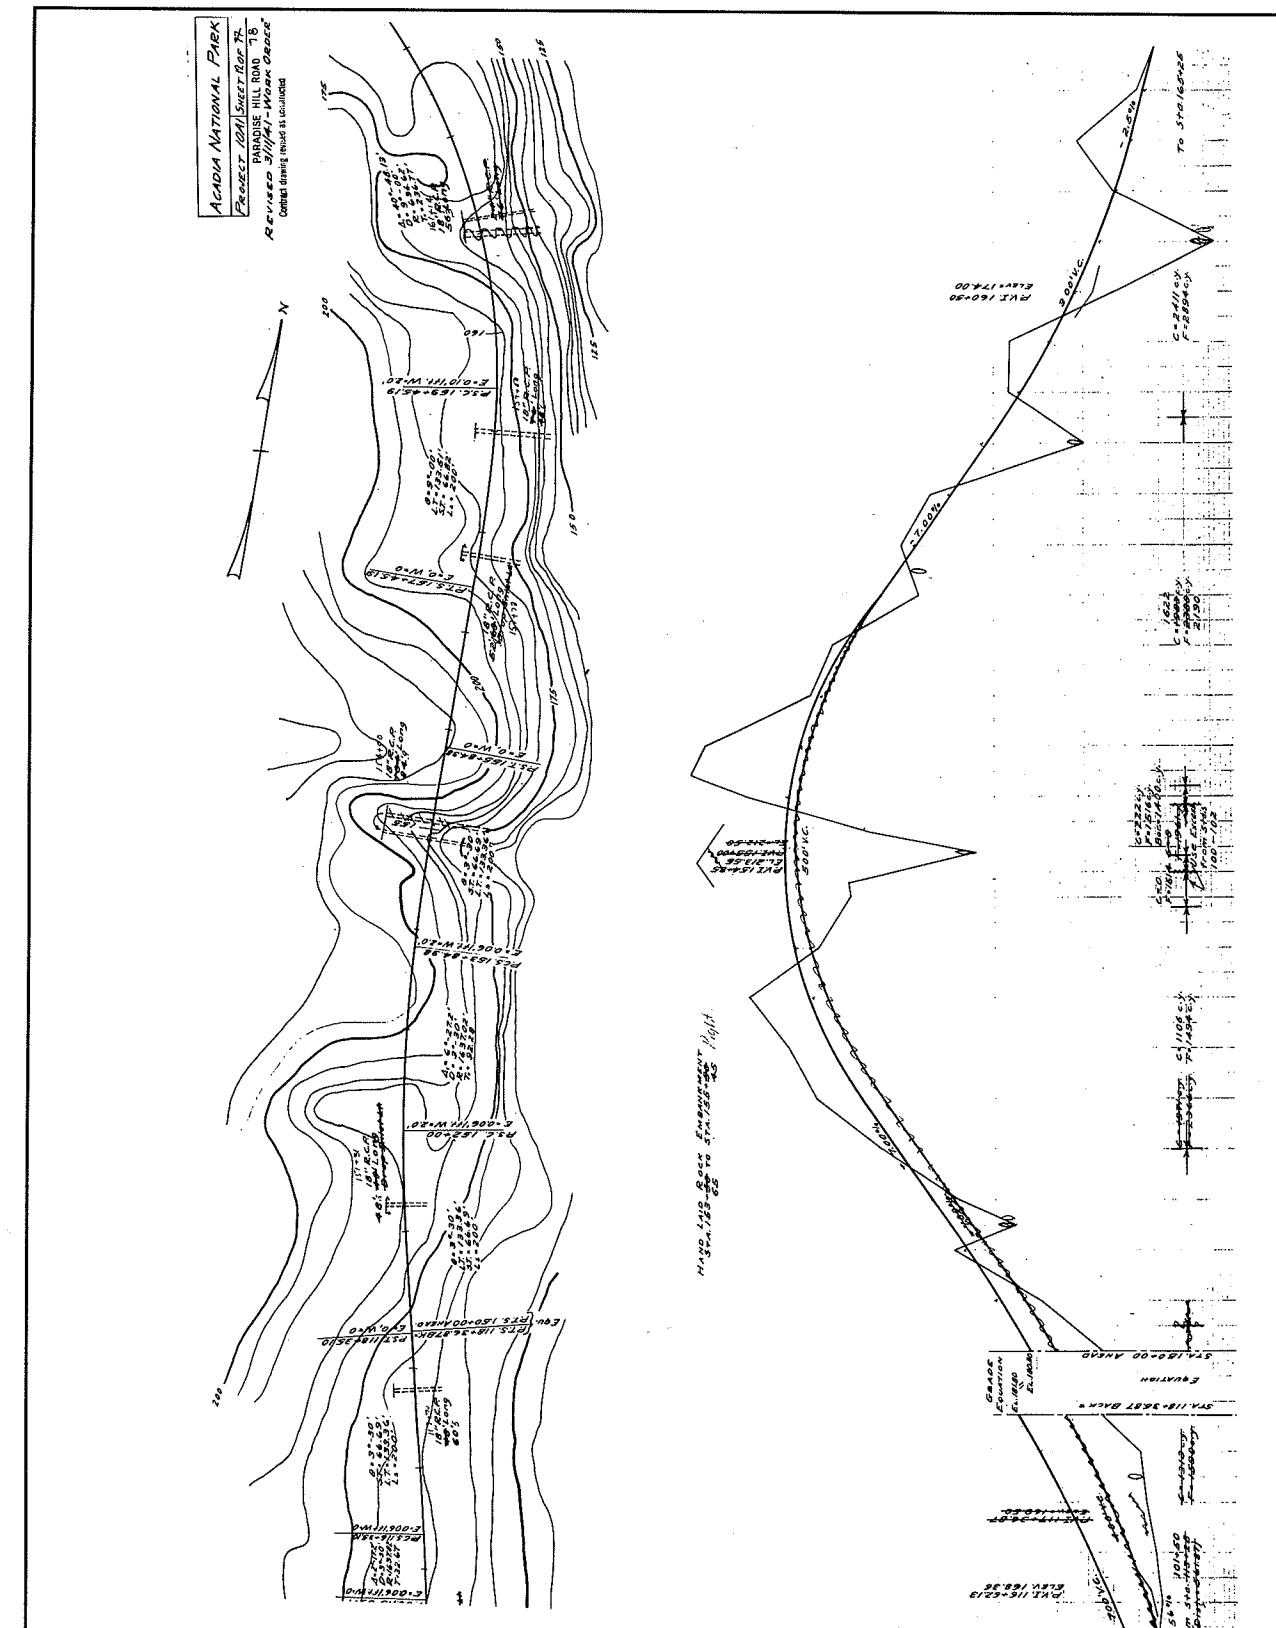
A sheet from the Paradise Hill Road "As Built" drawings, 1941. Drawing courtesy Federal Highway Administration.
